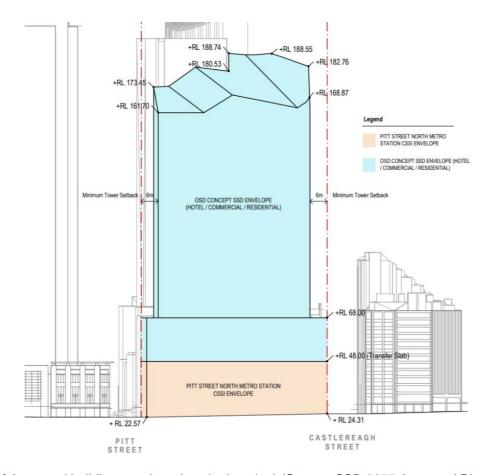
| Approved building envelope (south elevation) (Source: SSD 8875 Approved Plans)
